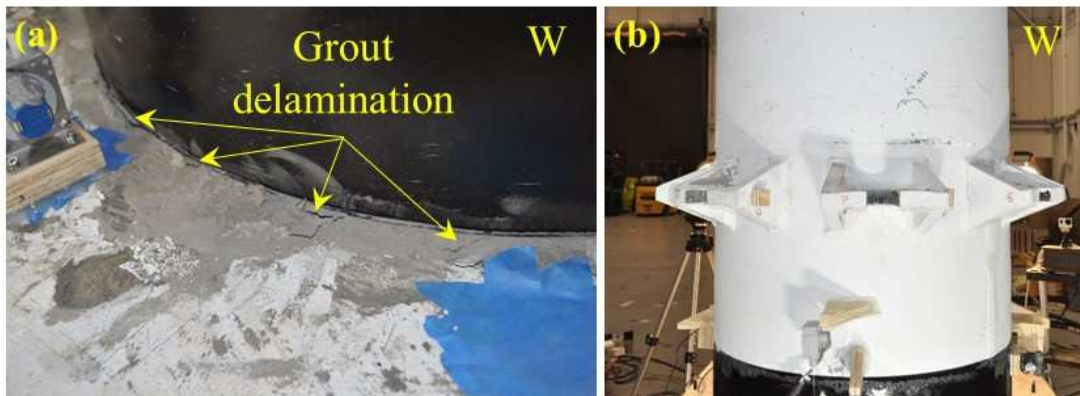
Damage state in PU column at $1.2 \times DE$: (a) grout delamination at the loading rate of 0.11 in/sec; (b) crack in concrete at the loading rate of 5.41 in/sec.
